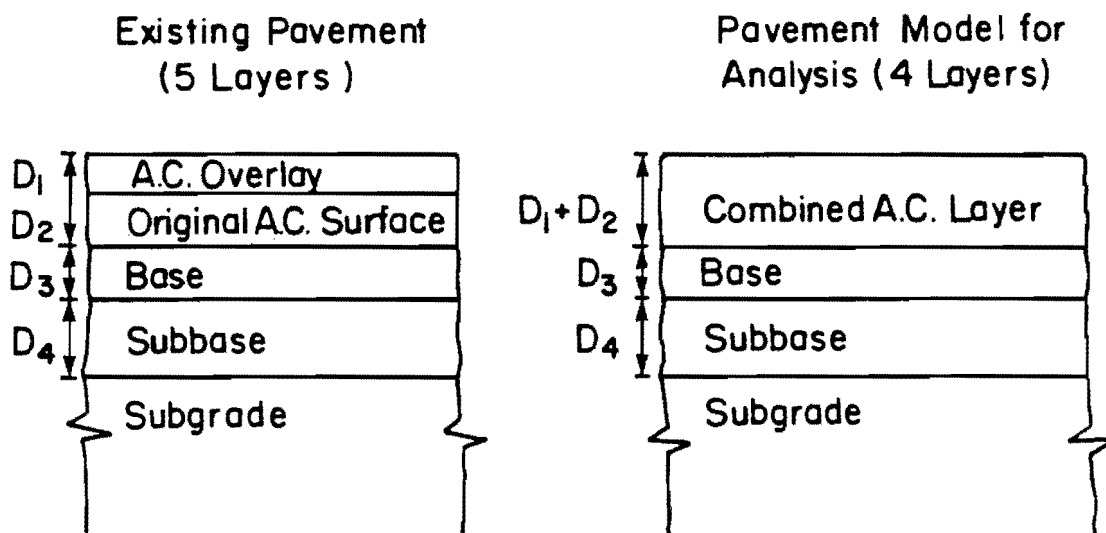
Idealized pavement model for a flexible pavement overlaid with one or more AC layers.
